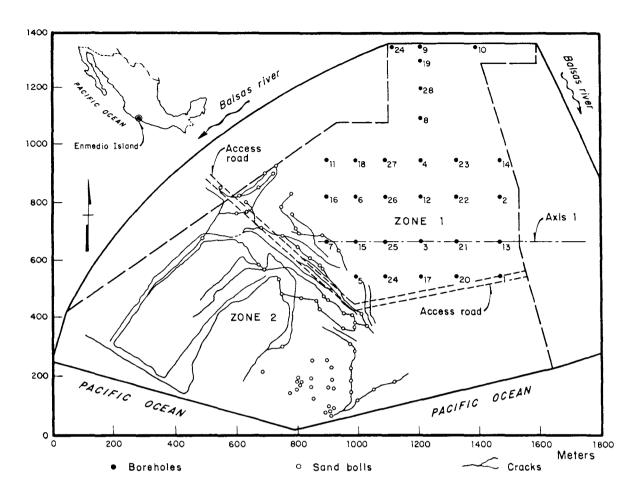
Plan view of the site. Boring location and observed damage cracks and sand boils
